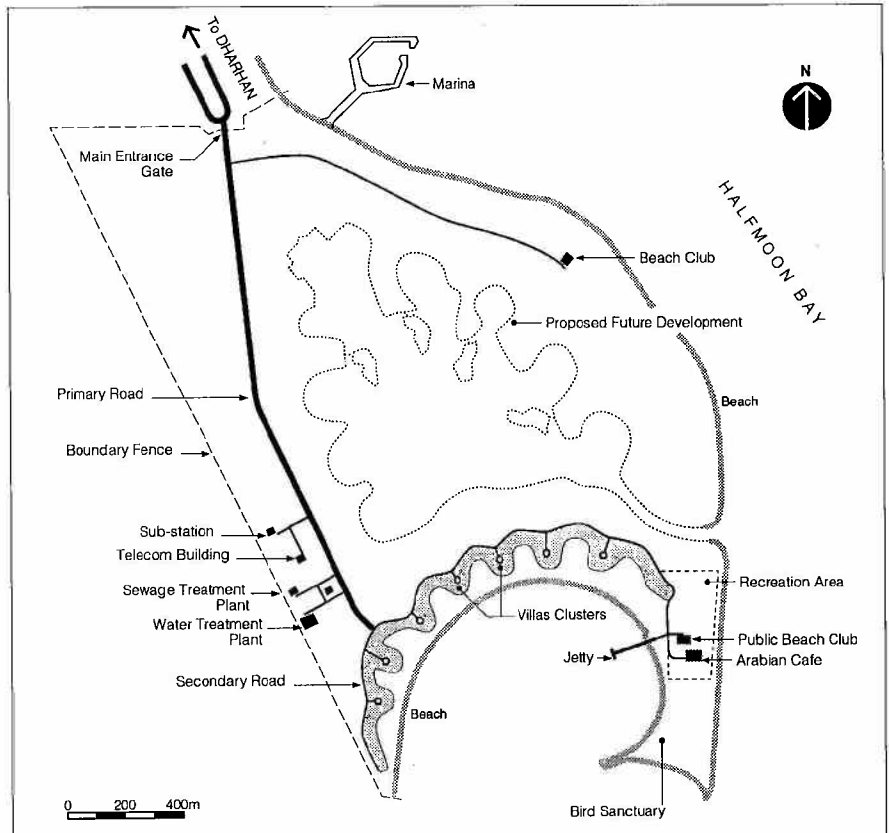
Plan showing location of apartments, bungalows and villas arranged in eight clusters around the bay
